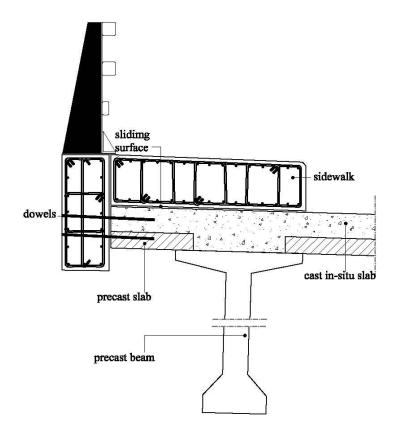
Cross-section of the sidewalks-restrainers (section B-B in Fig.2.1)
